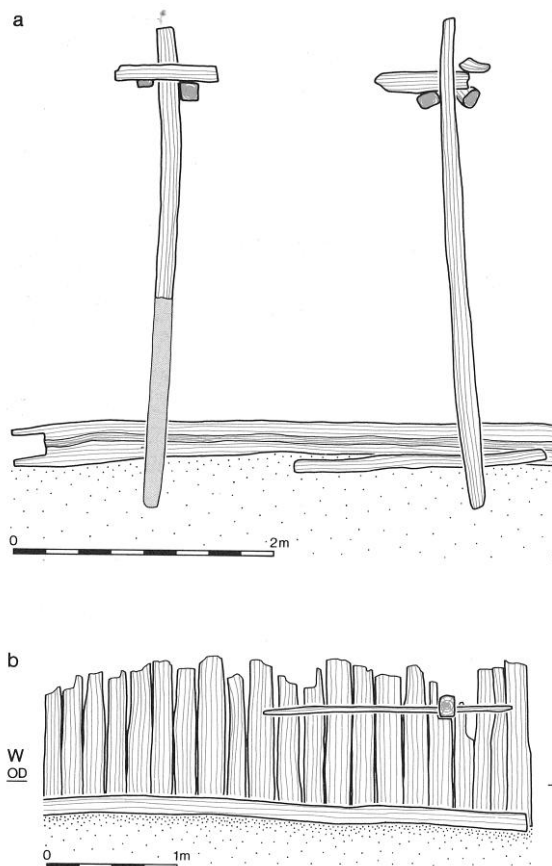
, Waterfront structure BG10 (Billingsgate, London), mid – late 12th-century. Plan to top, elevation below. Note the rail/locking bar arrangement retaining wall of vertical planking. (reproduced from Milne 1992)
